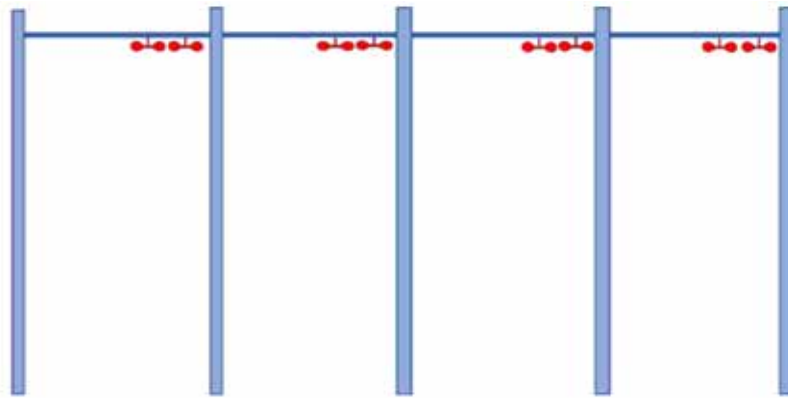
Stockbridge Damper Placement Example 2
